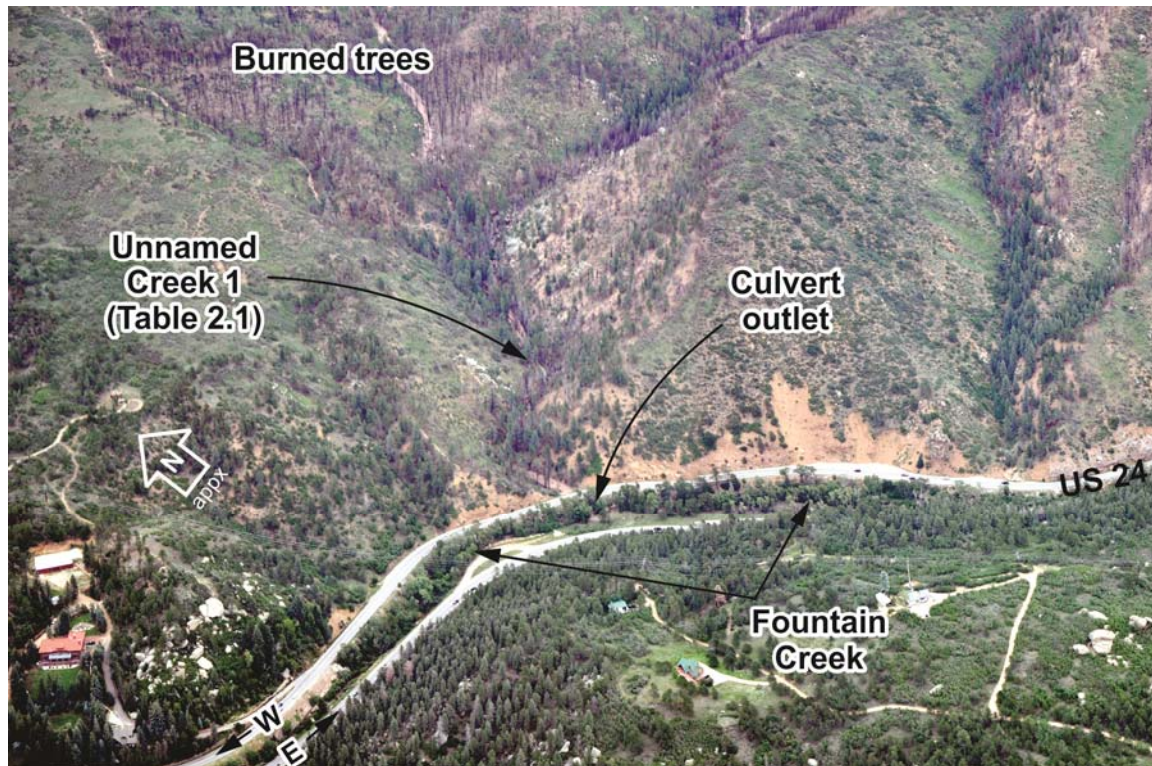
Aerial oblique photograph of Unnamed Creek 1 showing US 24, Fountain Creek, and the culvert outlet location. The culvert inlet location at westbound US 24 38.8900° N, -104.9586° W, approximate elevation 7195 ft.
